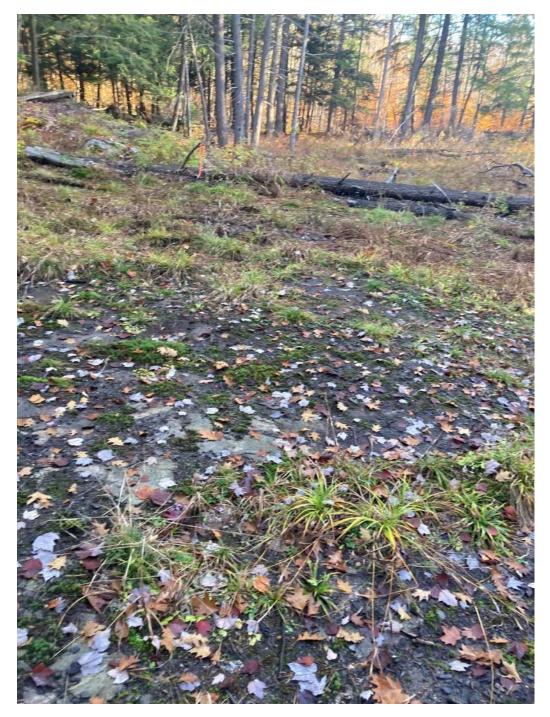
Debris noted in northeast area of Site near proposed road D.
